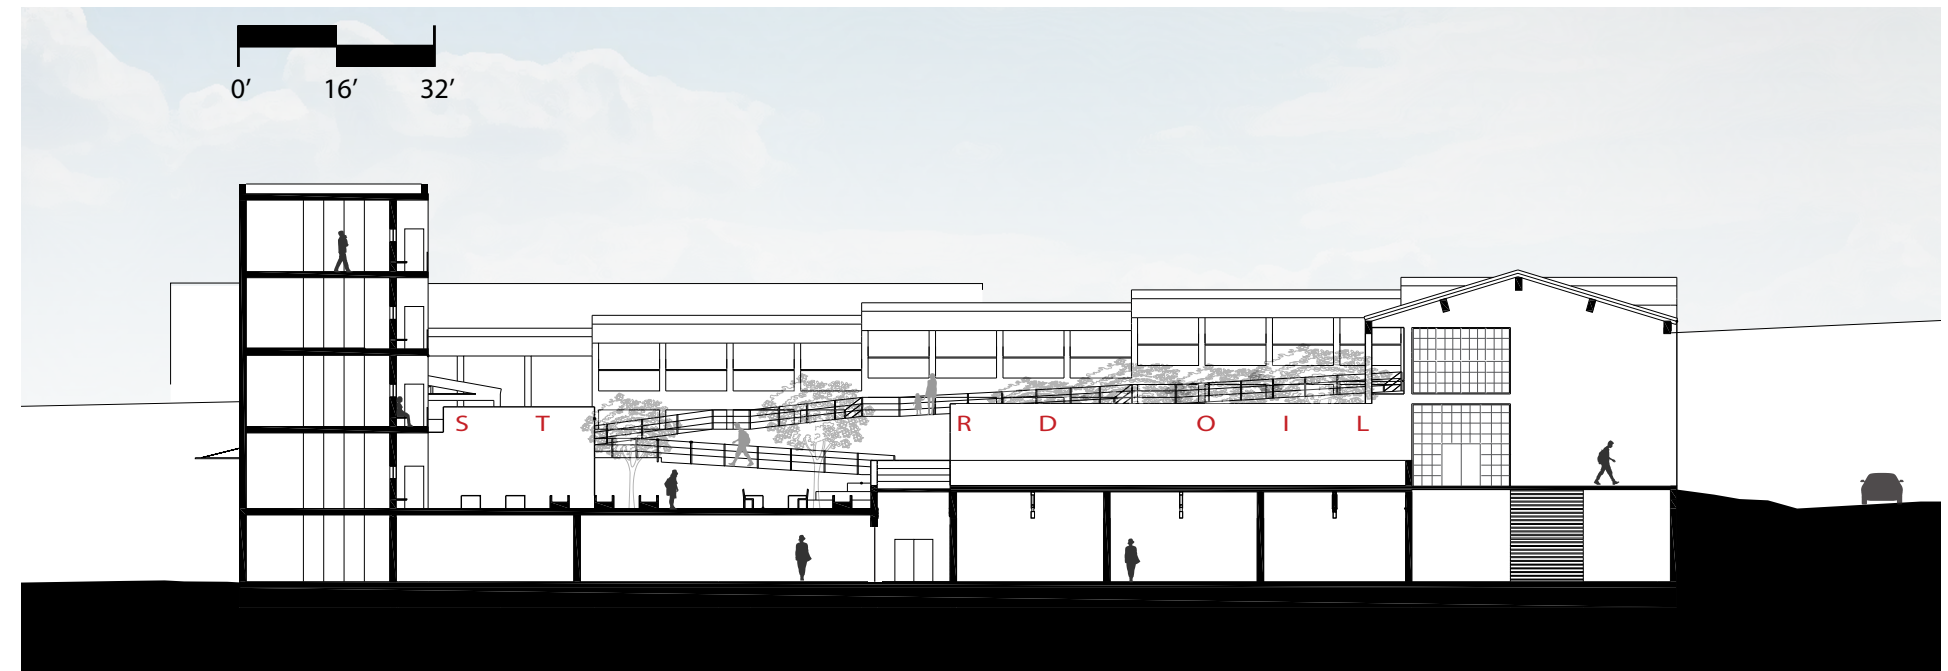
Section through the Food Preservation Center breezeway, the 1st-level classrooms, and the raised bed P-patch of the Residential Tower. The original "Standard Oil" sign on the containment wall can be seen beyond.
